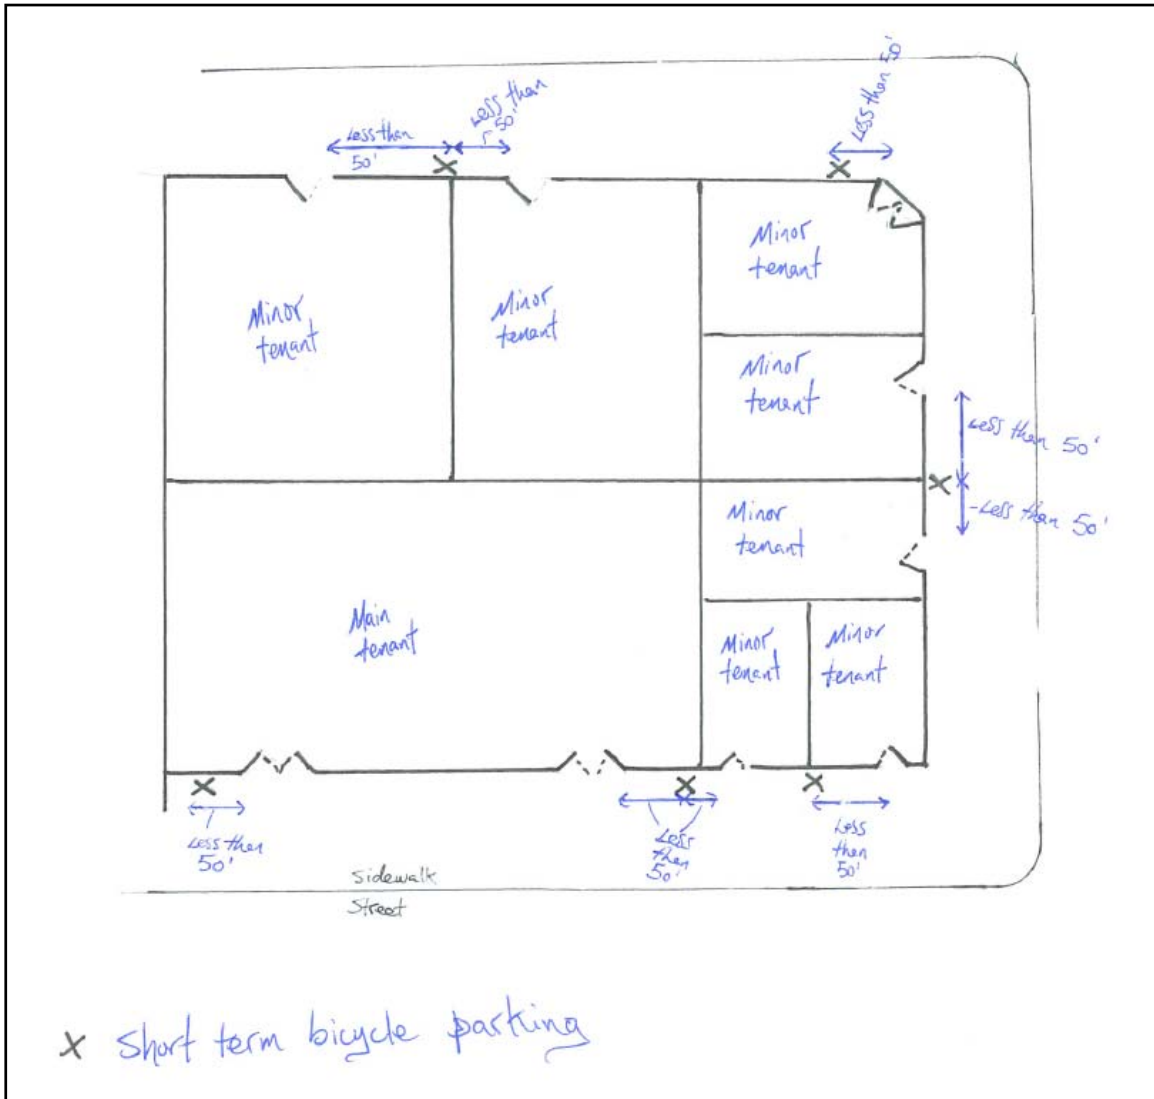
Short-term Bike Parking – Multiple Buildings, Multiple Entrances
